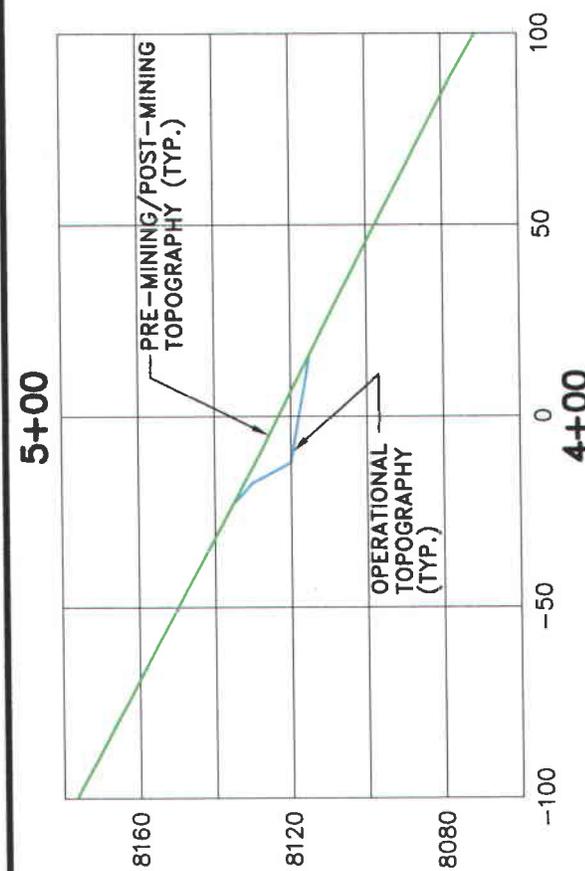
C. ROAD CROSS-SECTIONS FOR G-22
